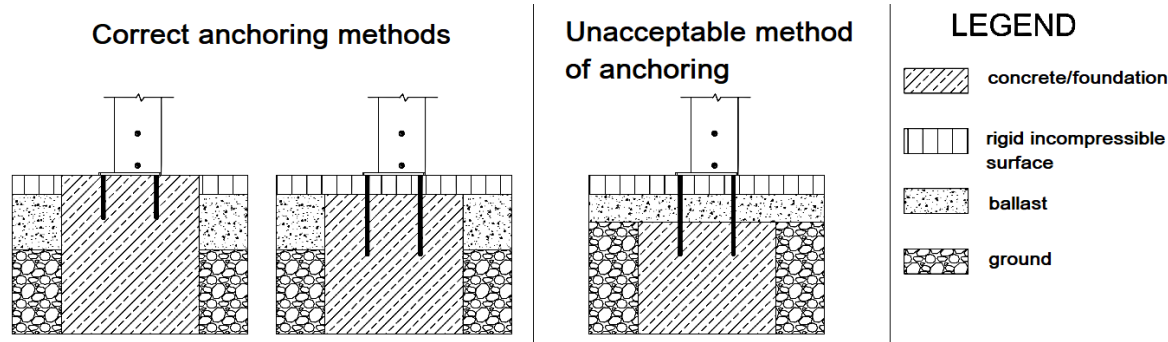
Guidelines for anchoring the SB500 Pergola support structure. Foundation
